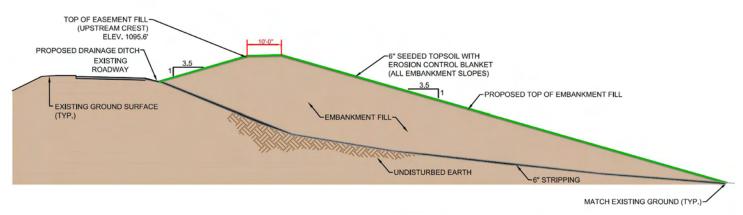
Cherokee Dam – Earthen Embankment Concept for Segment C-3
